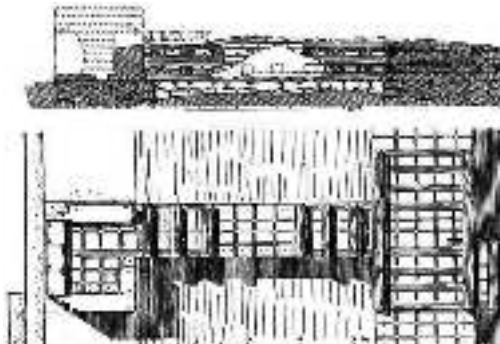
9th Century BC, wall detail, Zincirli Lower Palace (Nauman, R.)
